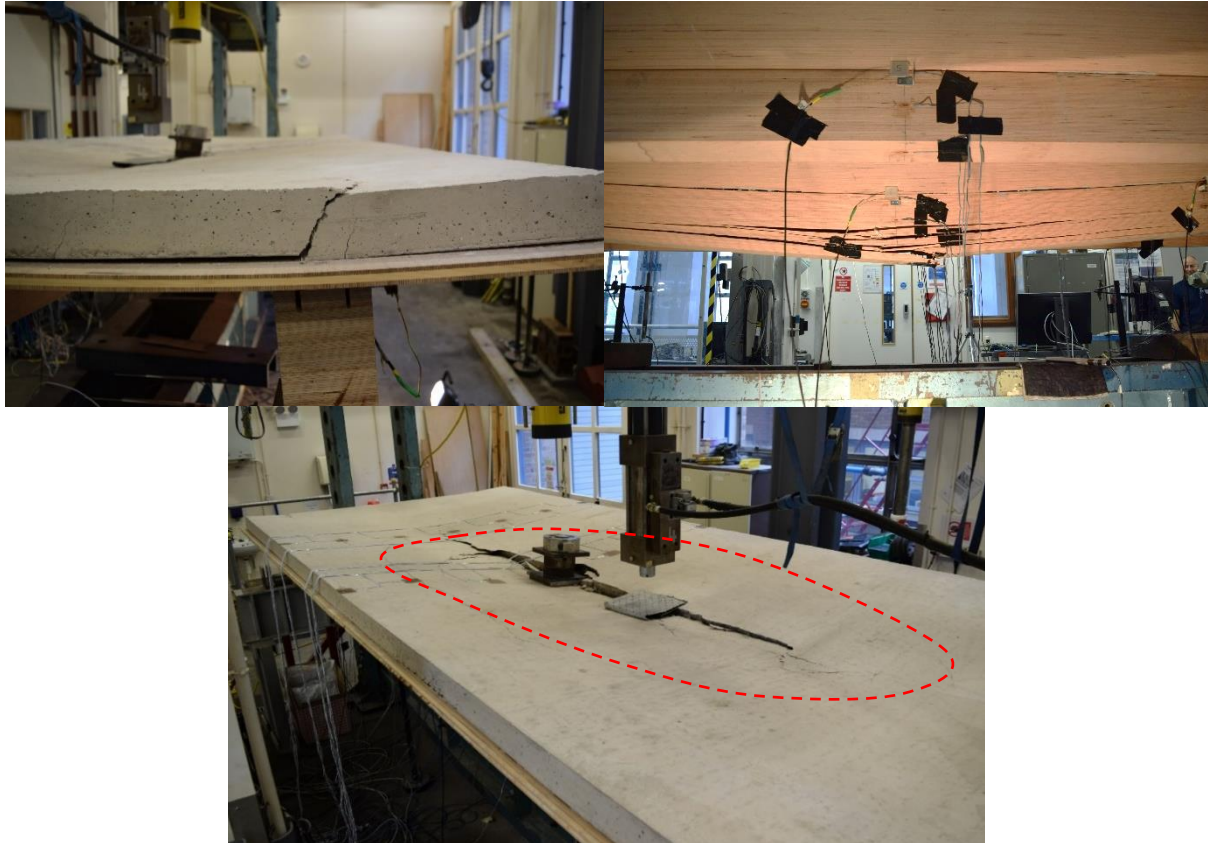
TCC Specimen Failure Modes – (a) Slab end split, (b) Fracture of J2, (c) Oval cracks and major split
